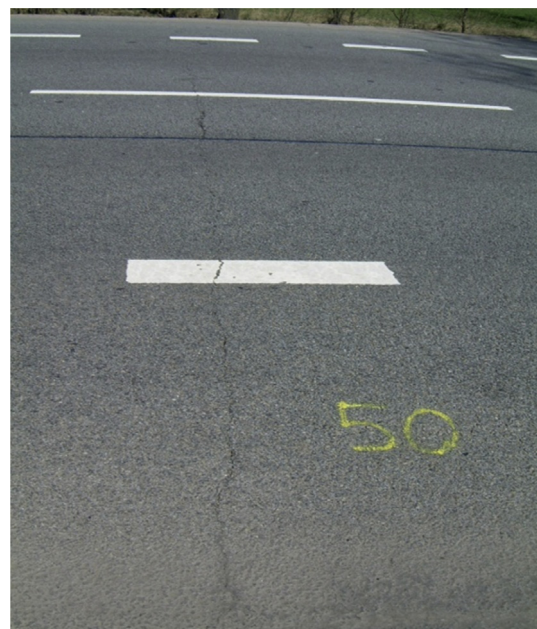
Transverse crack in pavement with an MCE base.
